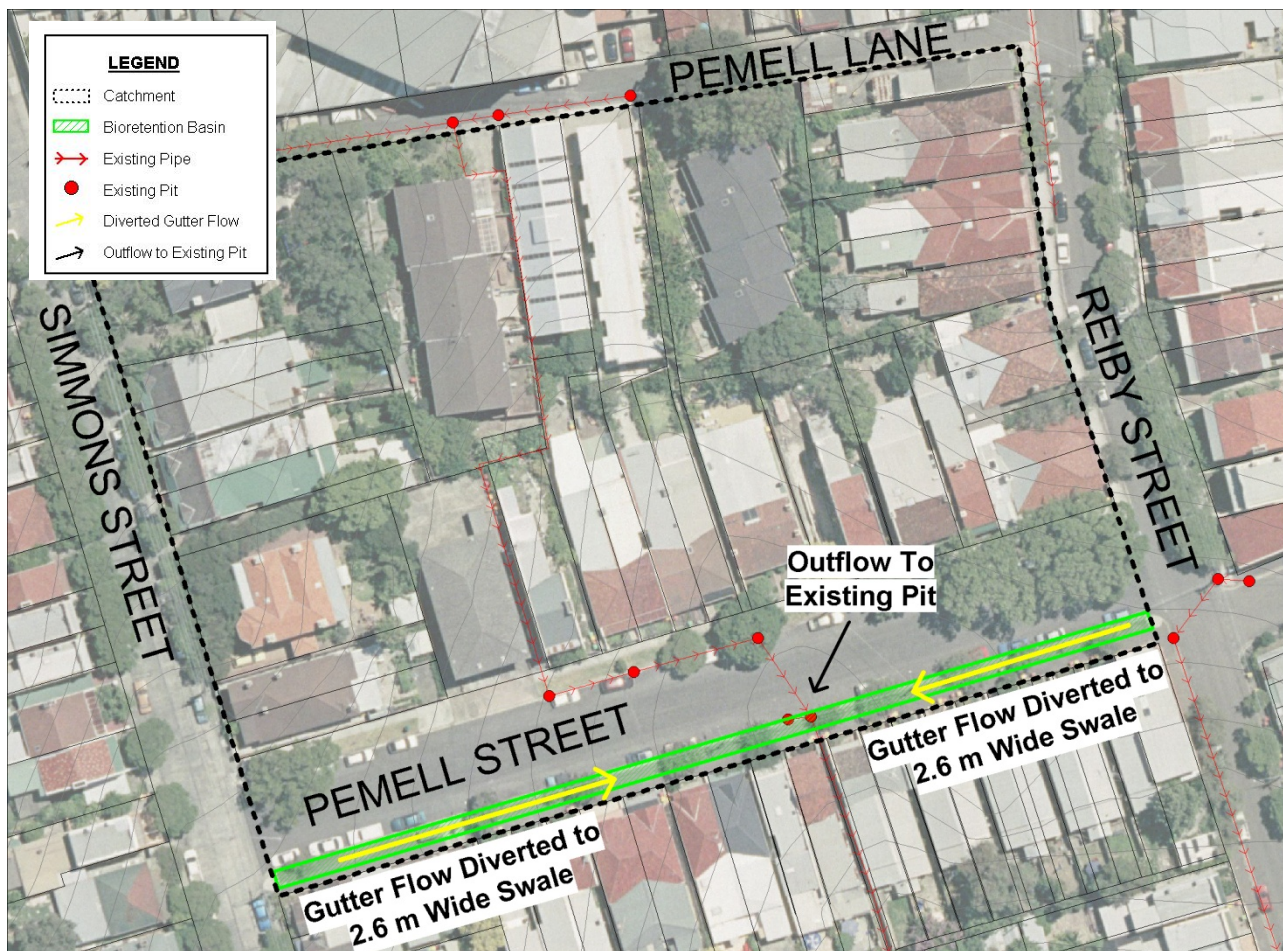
Pemell Street and surrounds. (Source: Dept Land)
